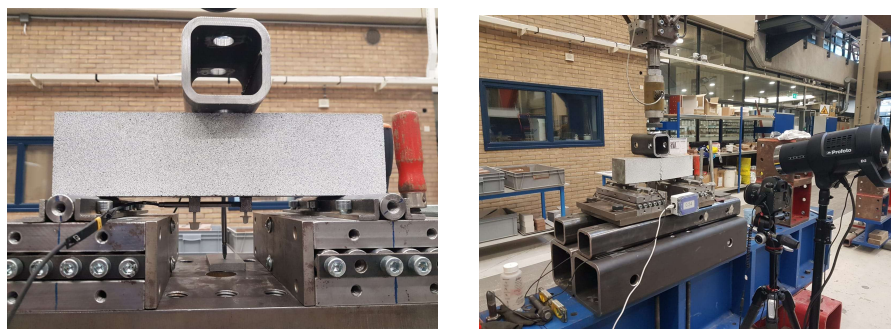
test setup of the 3-point bending test for the bistable interlocking joint
